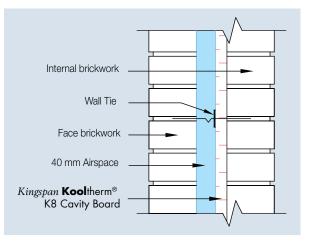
Side elevation – Double brick cavity wall with Kingspan Kooltherm<sup>®</sup> K8 Cavity Board
